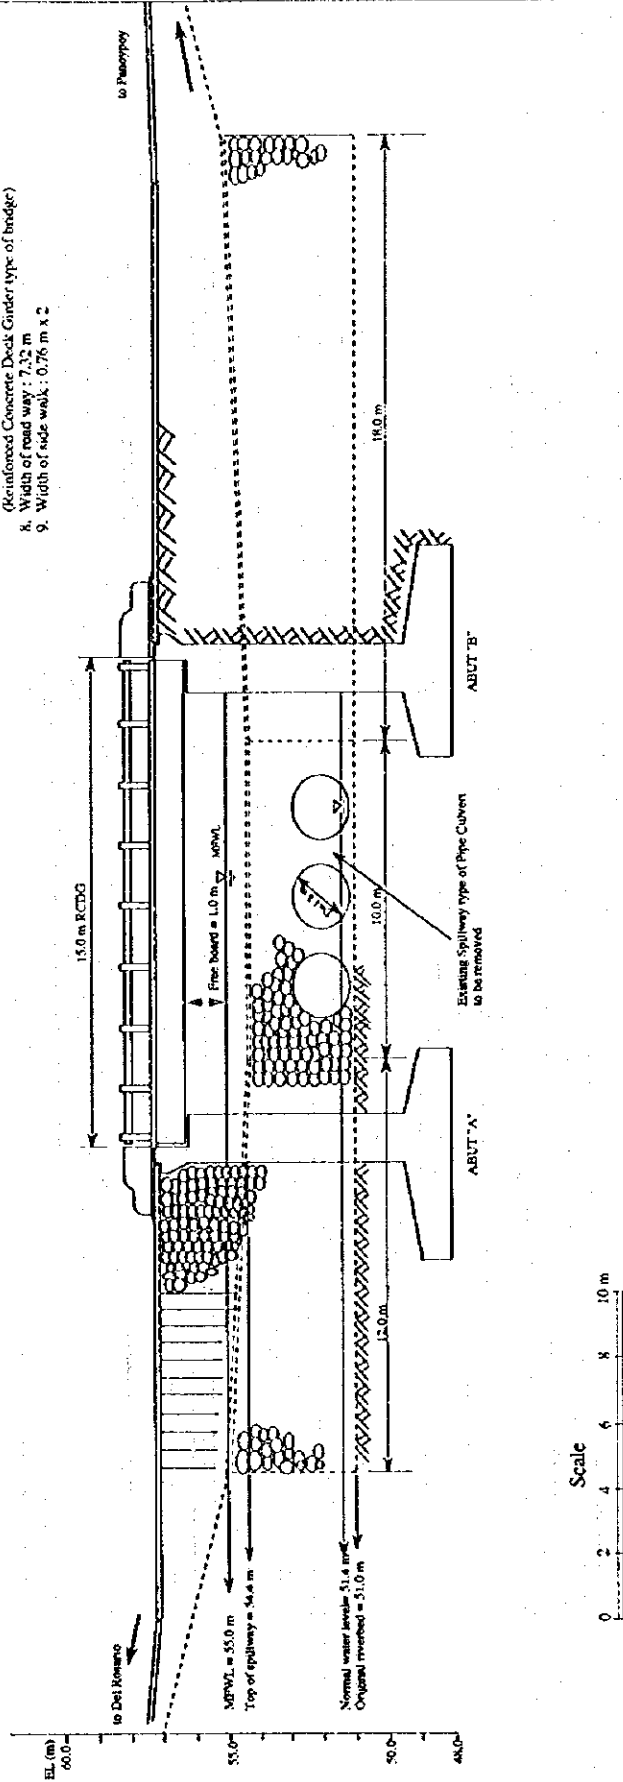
Proposed Bridge (1/3) (Agumit Bridge)
